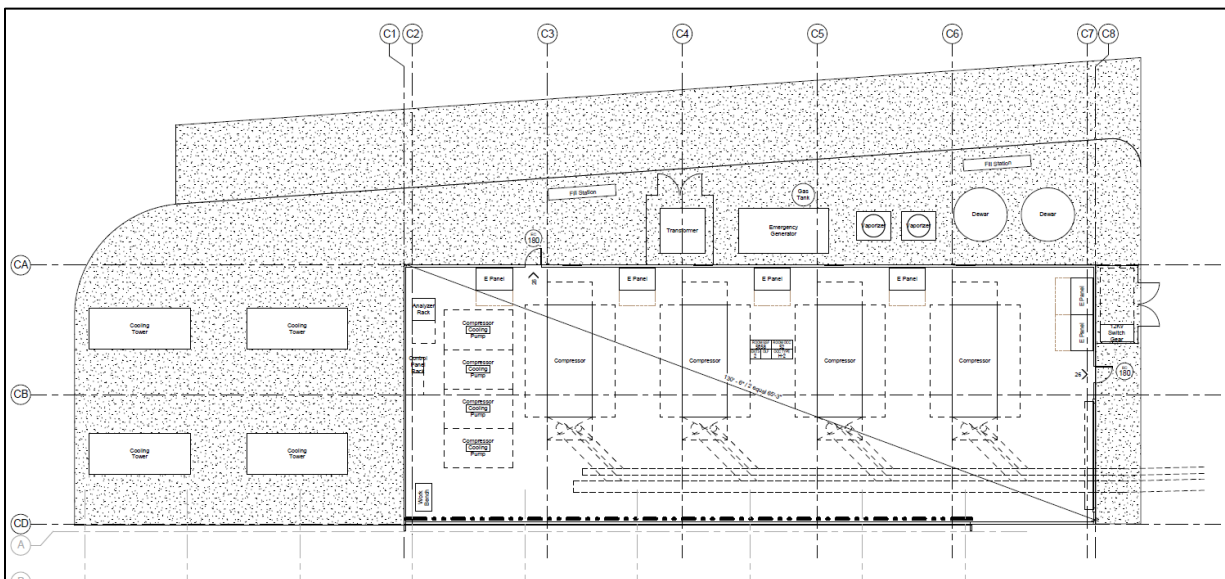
Architectural Layout of LBNF Cryogenic Compressor Building
